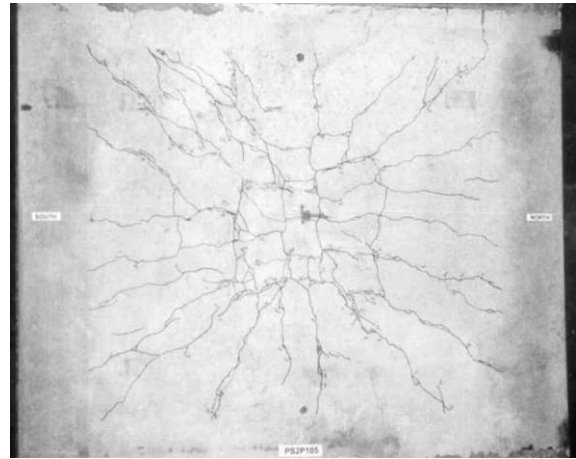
Crack pattern at failure for precast specimens [12]
